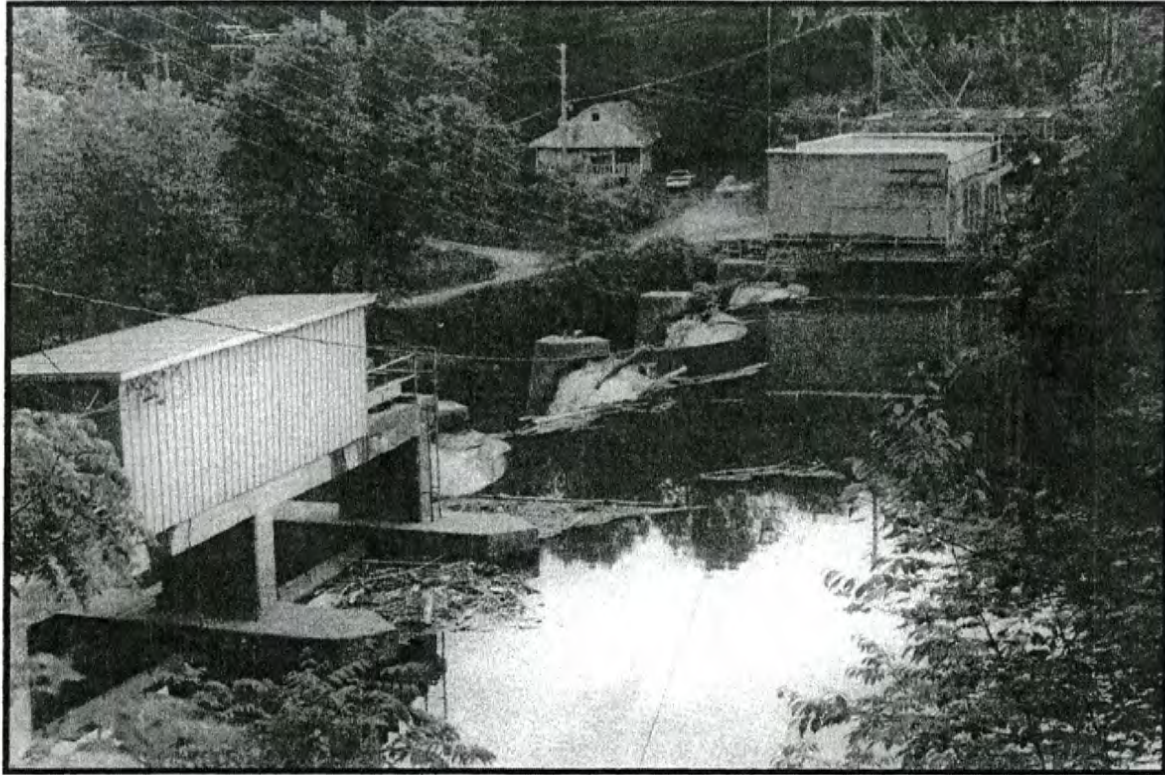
The Bryson Powerhouse, south facade, and Dam and gatehouse.
